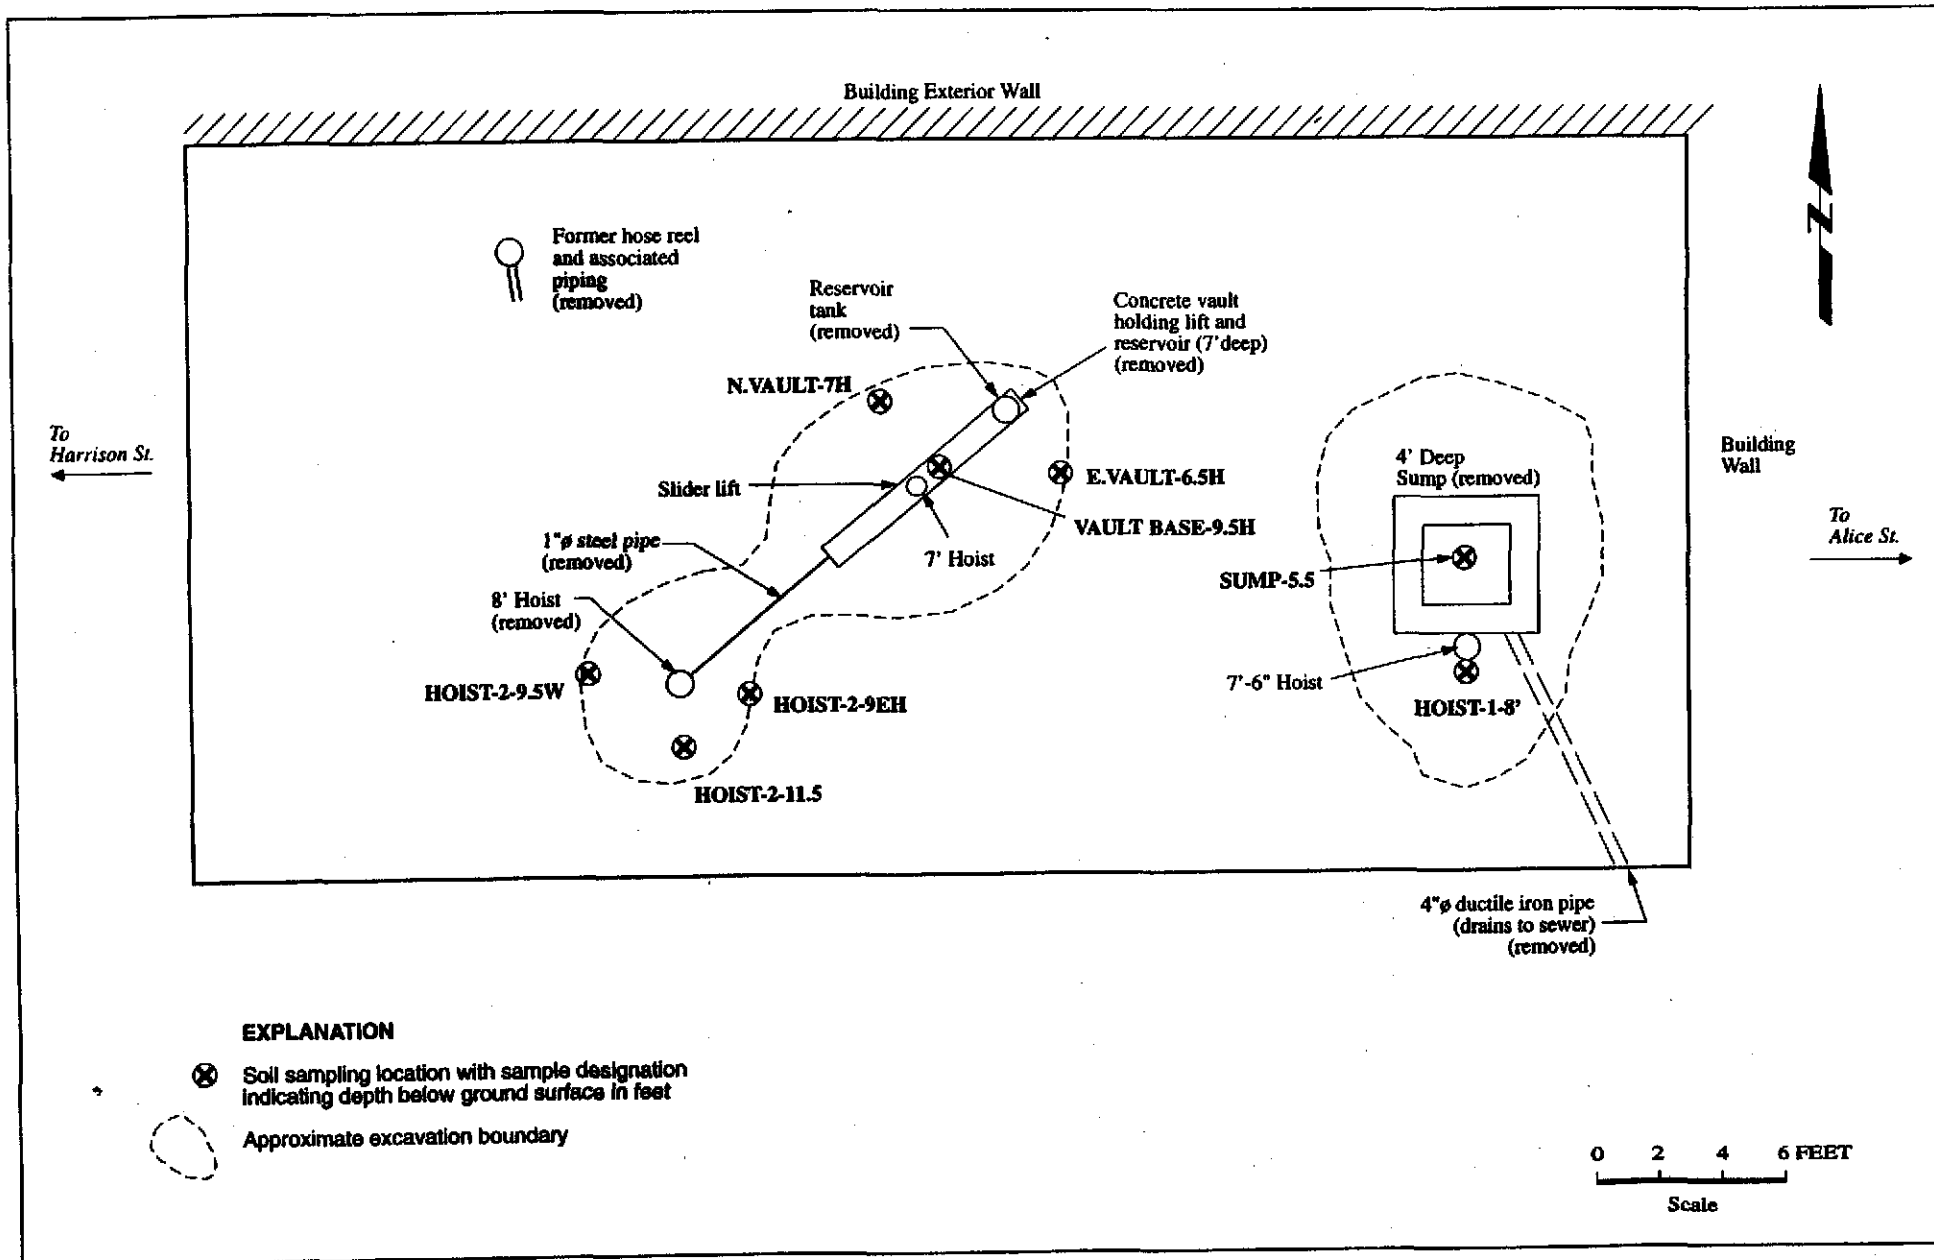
PLAN SHOWING FORMER LIFTS AND SUMP AND SOIL SAMPLE LOCATIONS
